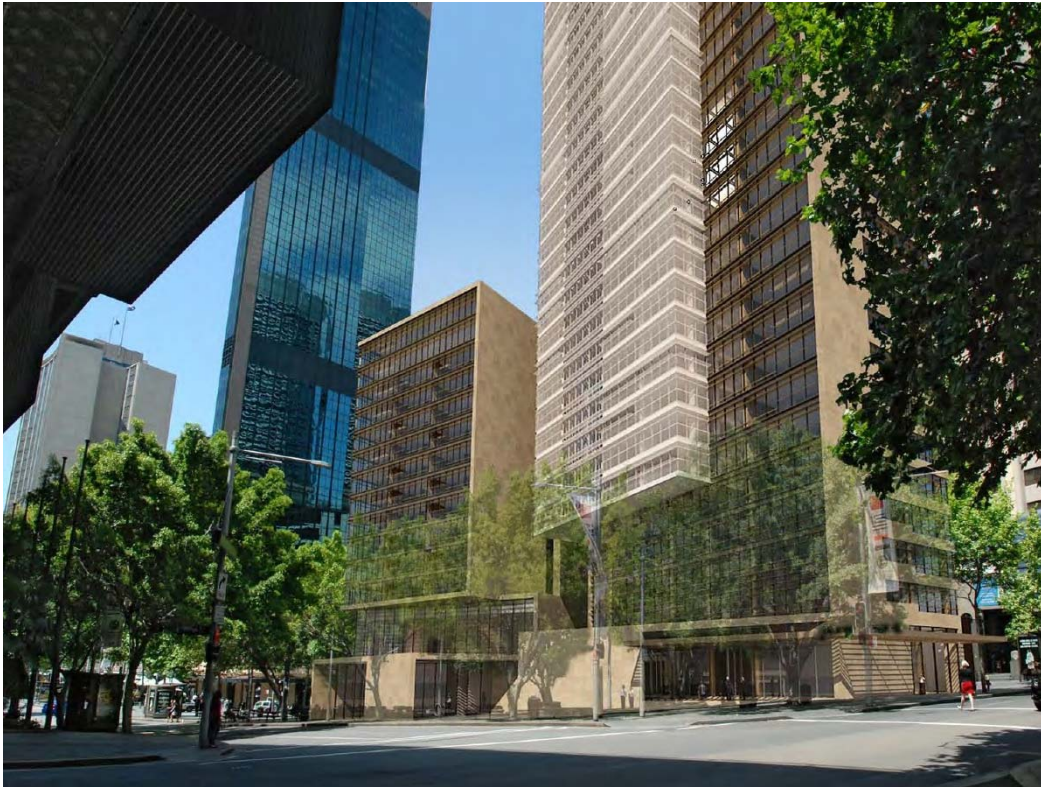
Photomontage from original Stage 2 DA from the north-west showing approved Buildings A and B (D/2010/2029)
